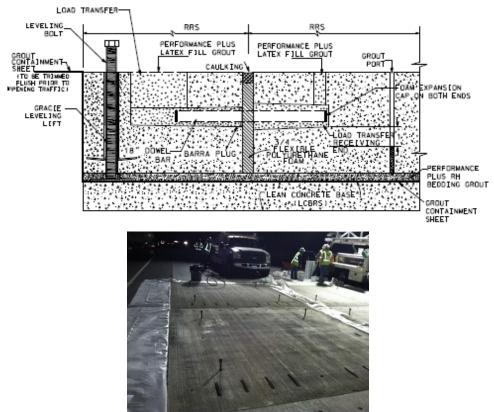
Diagram and photo. The installed Rapid Roadway system.
